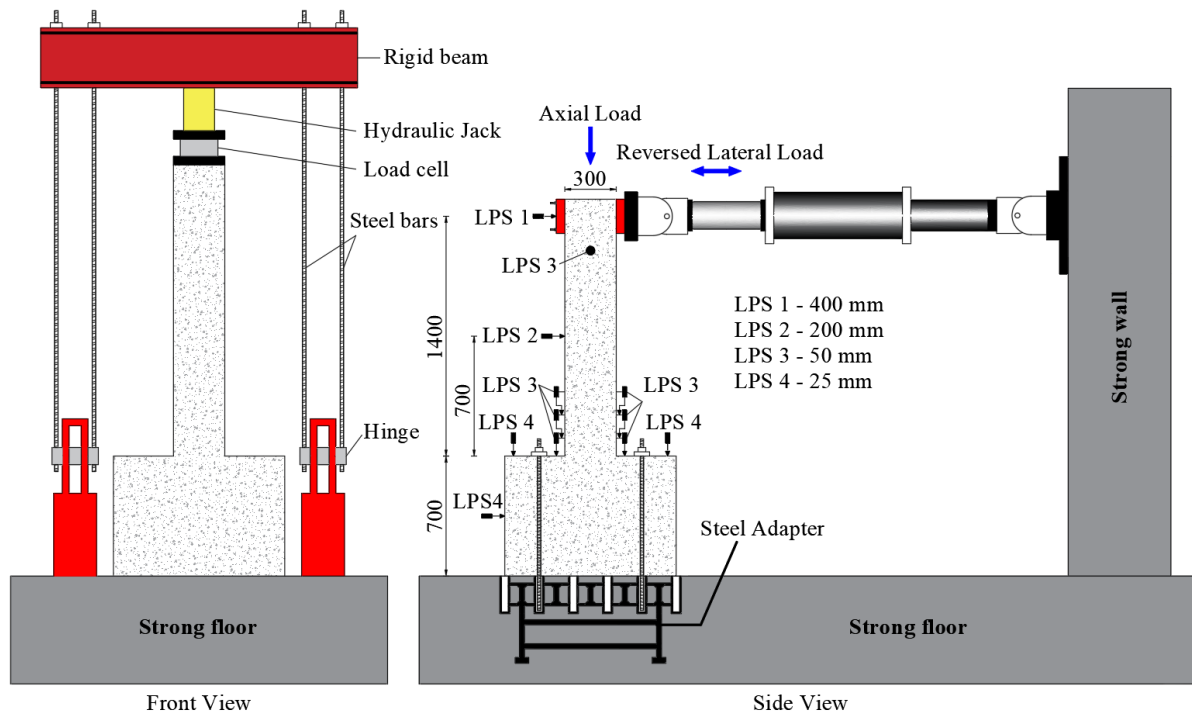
Test setup and instrumentation (all dimensions in mm)
